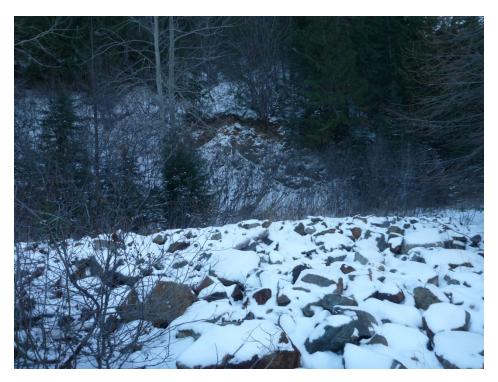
Minor instability of slope near spillway channel. Instability appears to be located downstream of drains installed in this slope during reclamation work (drains not visible through snow).
